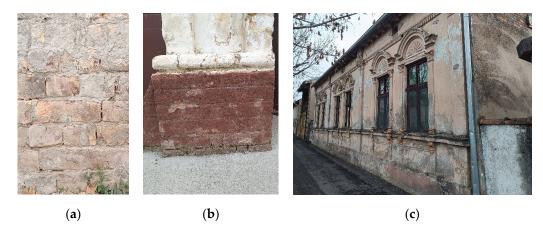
Photos of a house made of baked bricks: (a) details of a brick house wall; (b) details of a brick house pillar at the entrance door; (c) the facade of a house made of baked bricks.
